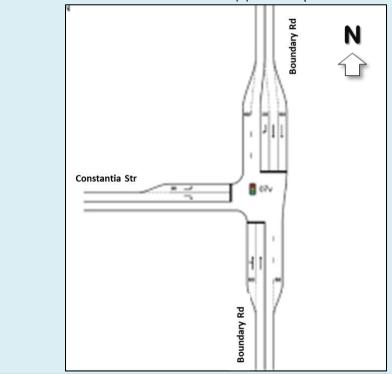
Proposed upgrades at the corner of Boundary Road and Constantia Street
